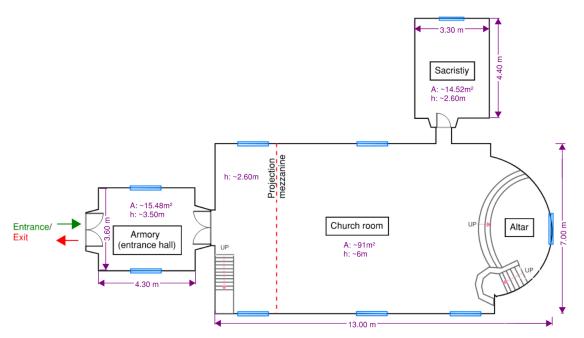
Sketch of Härlövs church layout based on its original floor plan provided in Brandskyddslaget's report (redrawn by Bianca Coutinho and adapted with authorization from Staffan Bengtson, here representing Brandskyddslaget).
